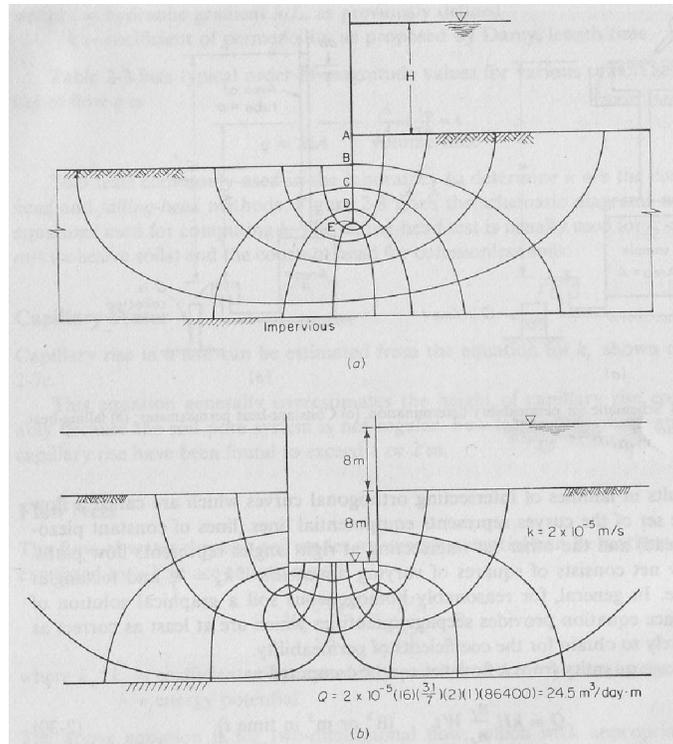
Typical flow nets as used for sheet-pile or cofferdam structures. (a) Single sheet-pile wall or other wall too far to influence net; (b) double-wall cofferdam -9§ used for bridge piers, etc.
